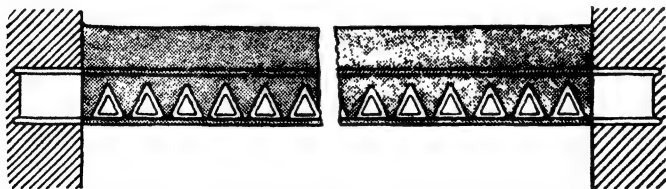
Terra-Cotta Floor (Early Tubular Type).
